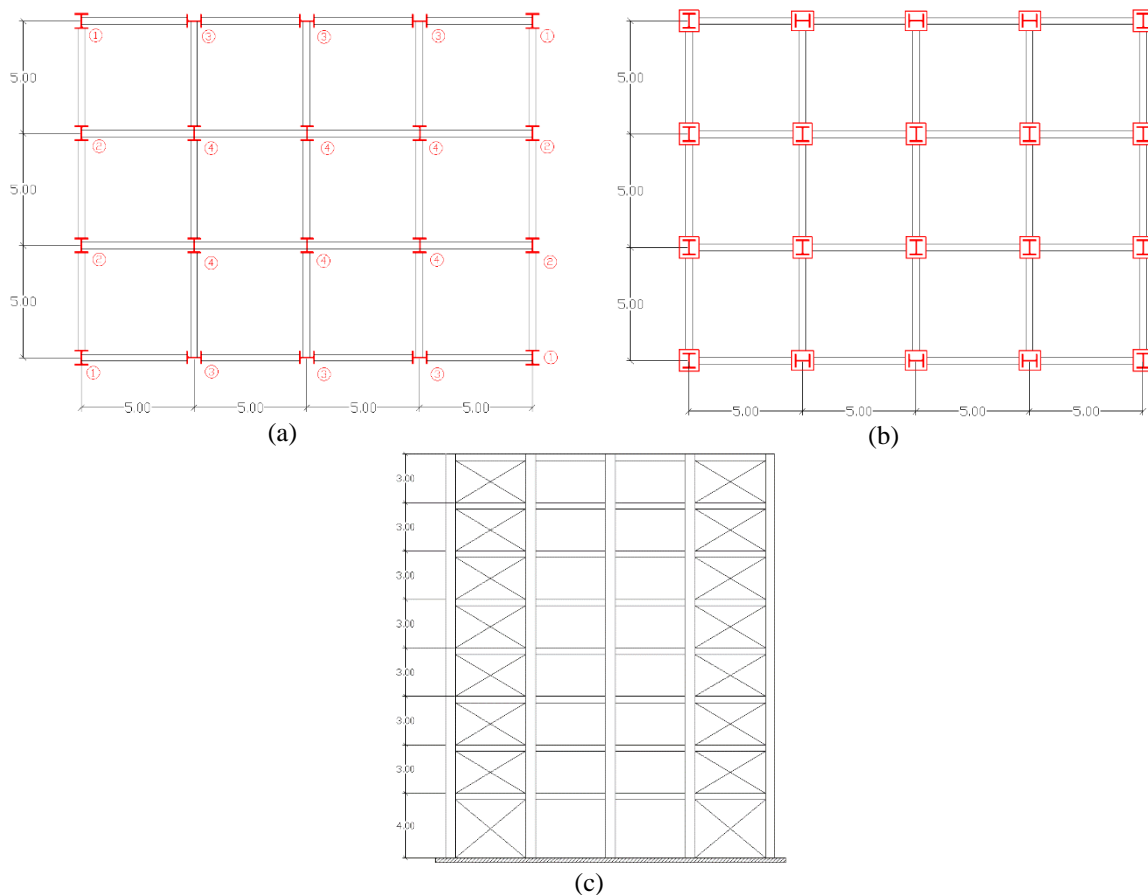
Test examples - (a) steel building plan view, (b) steel-RC composite building plan view and (c) eight-storey steel building front view
